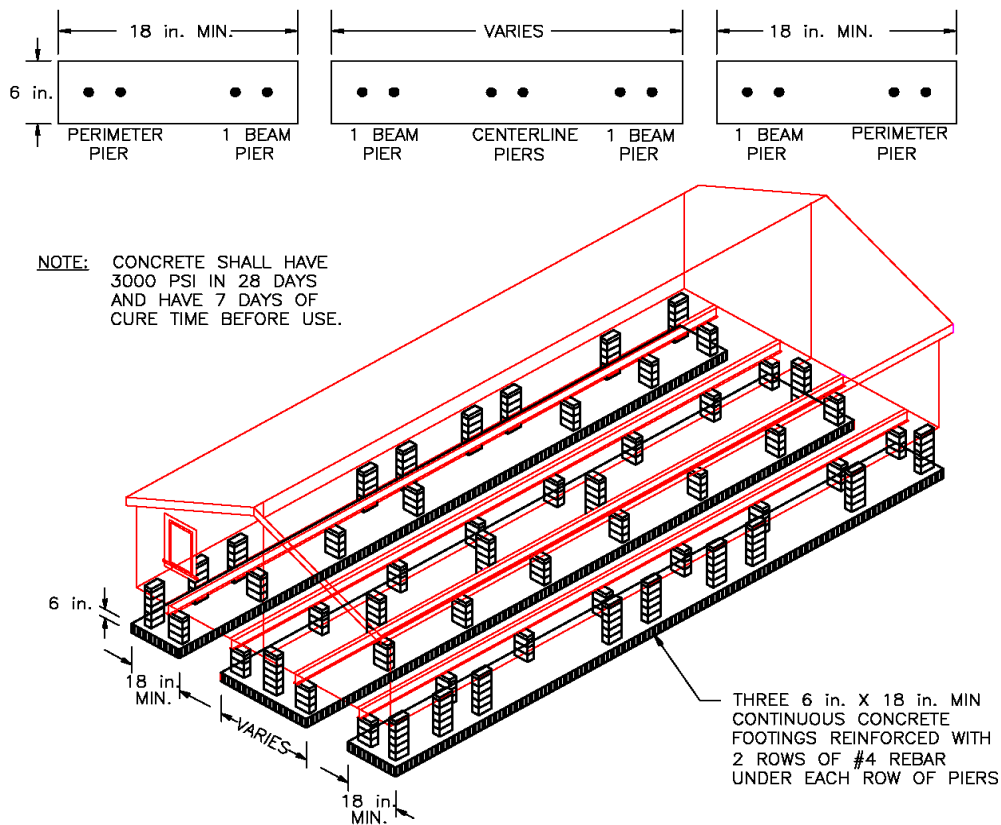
(b) Typical Combined Continuous Concrete Footings (Three-Pad-Pour)
